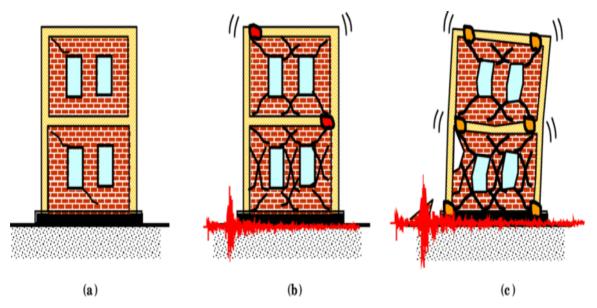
Earthquake-Resistant Design Philosophy for buildings: (a) Minor (Frequent) Shaking – No/Hardly any damage, (b) Moderate Shaking – Minor structural damage, and some non-structural damage, and (c) Severe (Infrequent) Shaking – Structural damage, but no collapse
